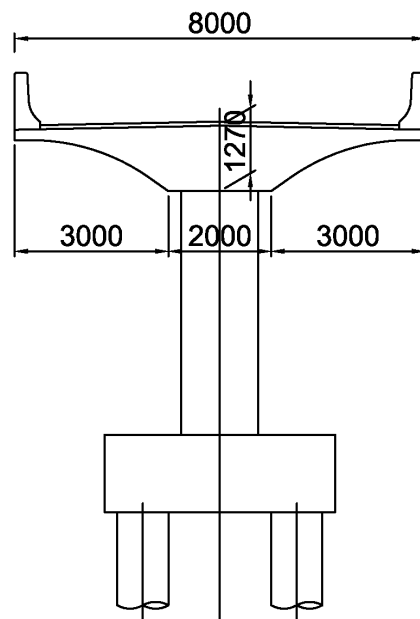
Typical Interchange Ramp B (1-way) Bridge (PC Solid Slab L=25 m)
